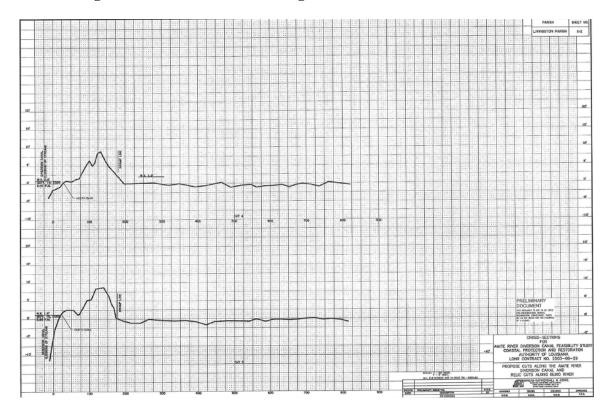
Cross Sections of Dredged Material Berm on North Bank
